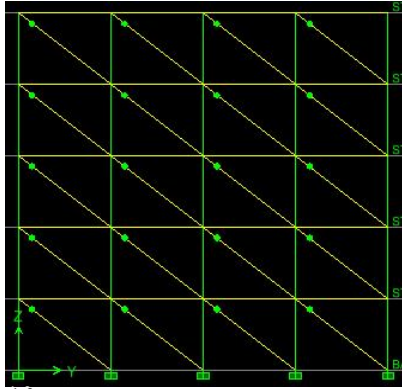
elevation for 4×4 bays infill as diagonal strut
